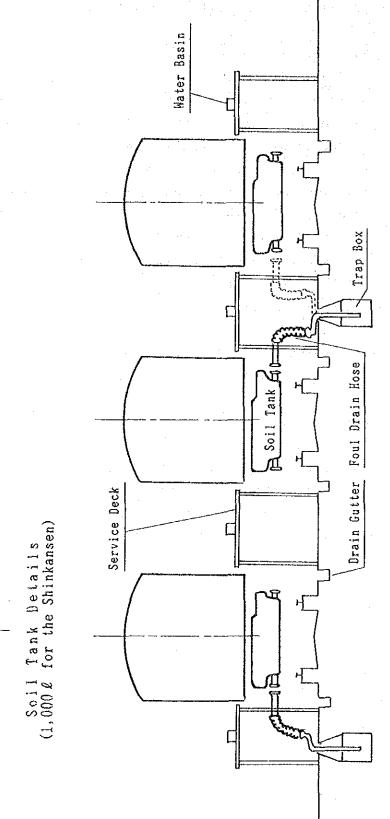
shows the soil draw out arrangement on the washing track. (2) Disposal facility
